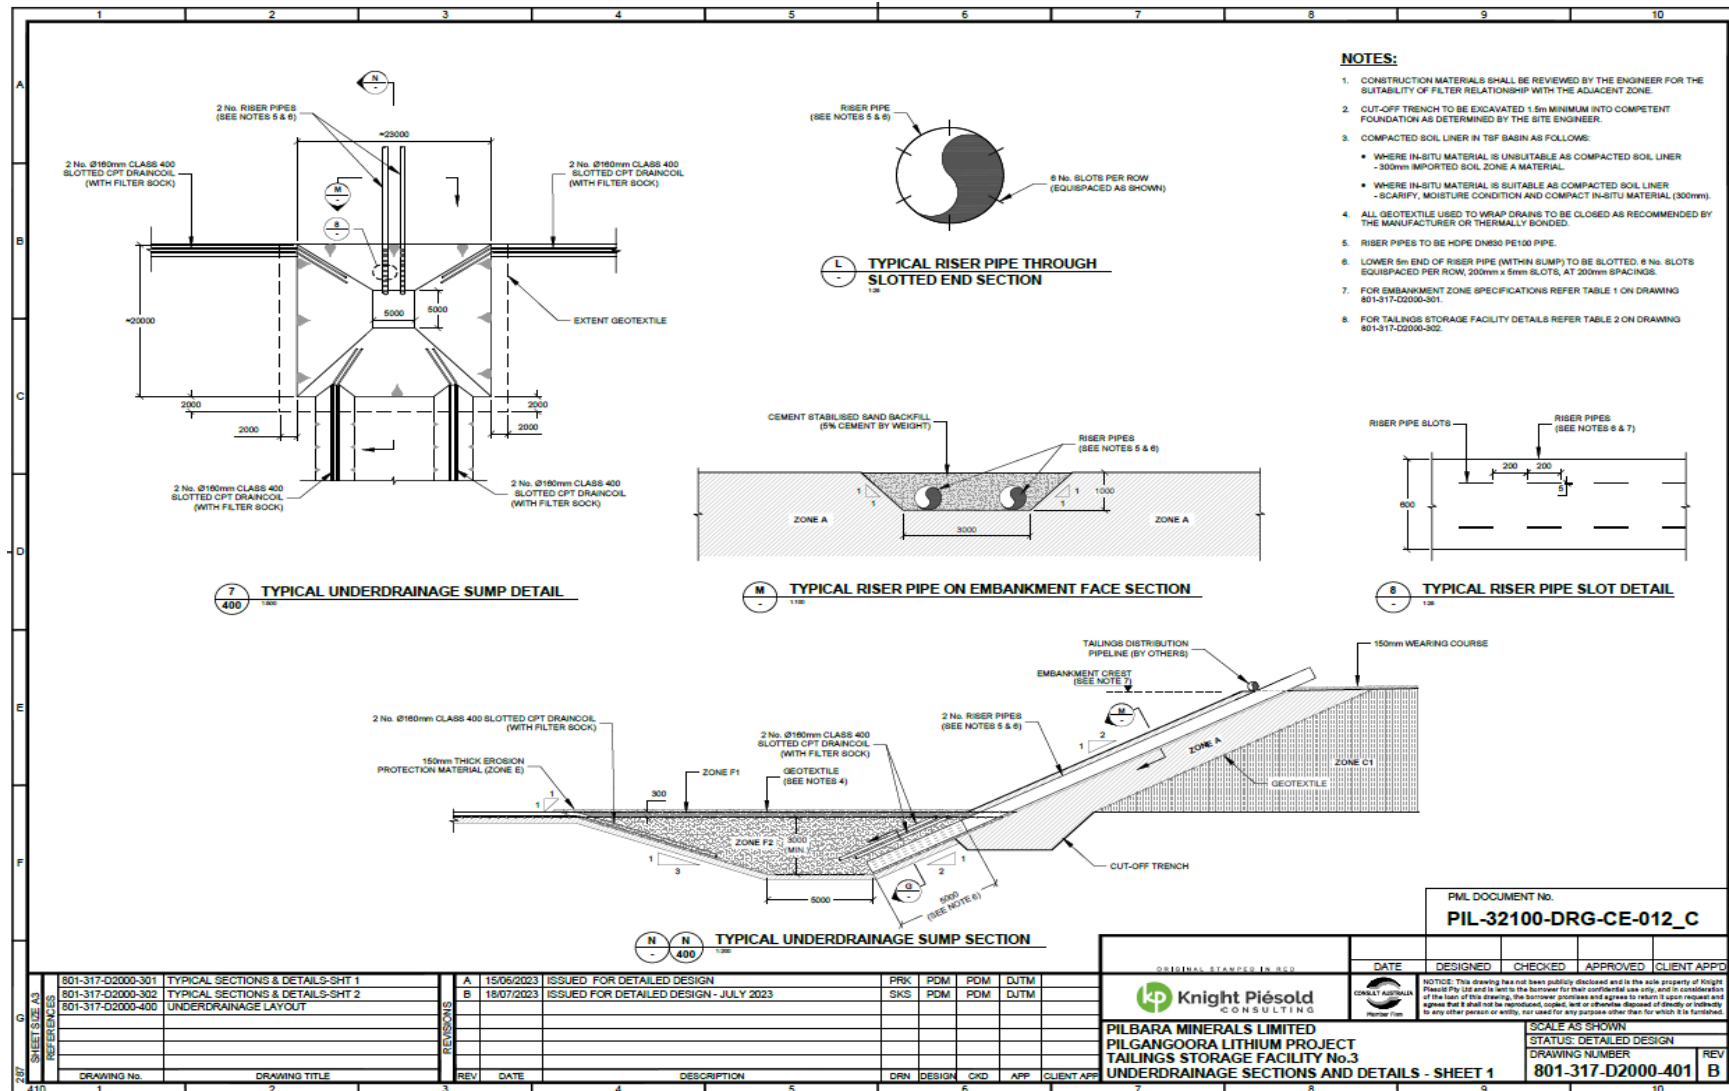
TSF3 Stage 1 underdrainage sections and details – sheet 1
